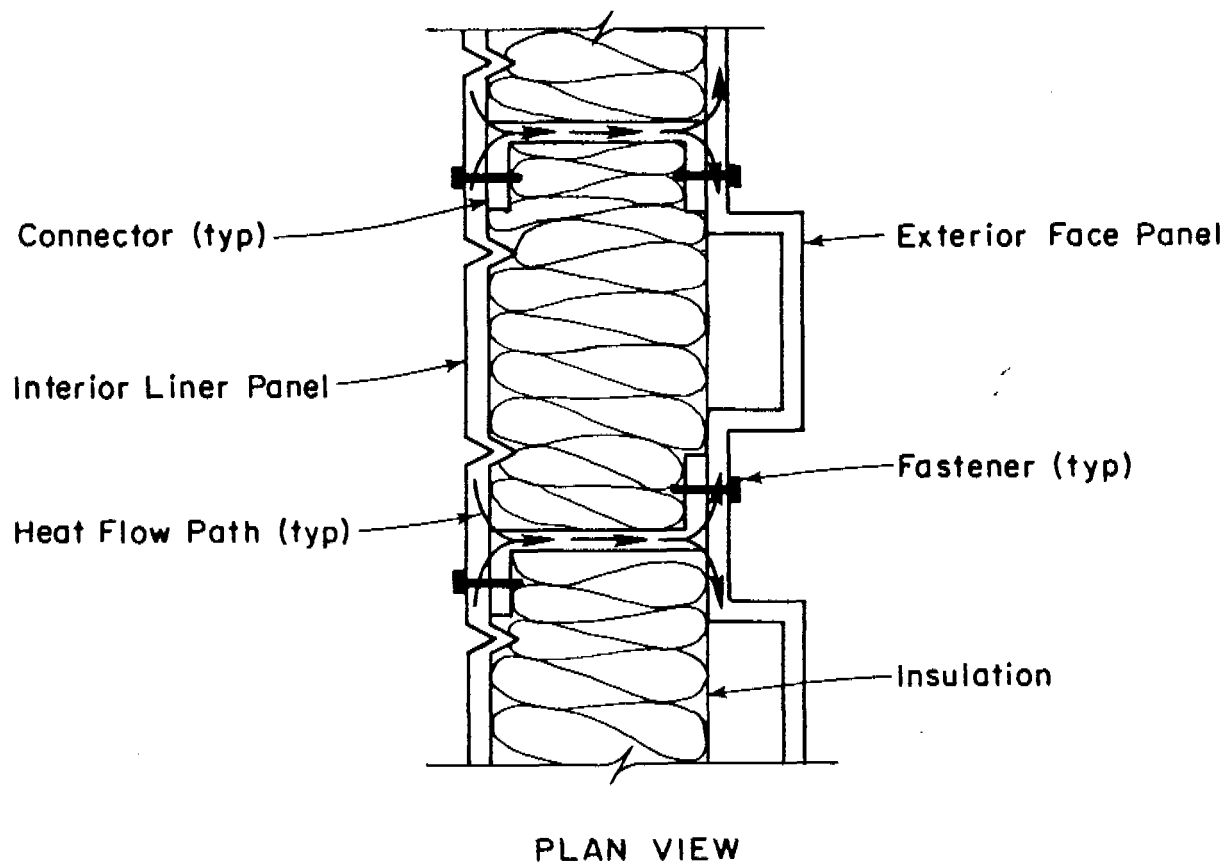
Thermal Bridge Through Insulated Metal Wall (Adapted from Ref. 5)
